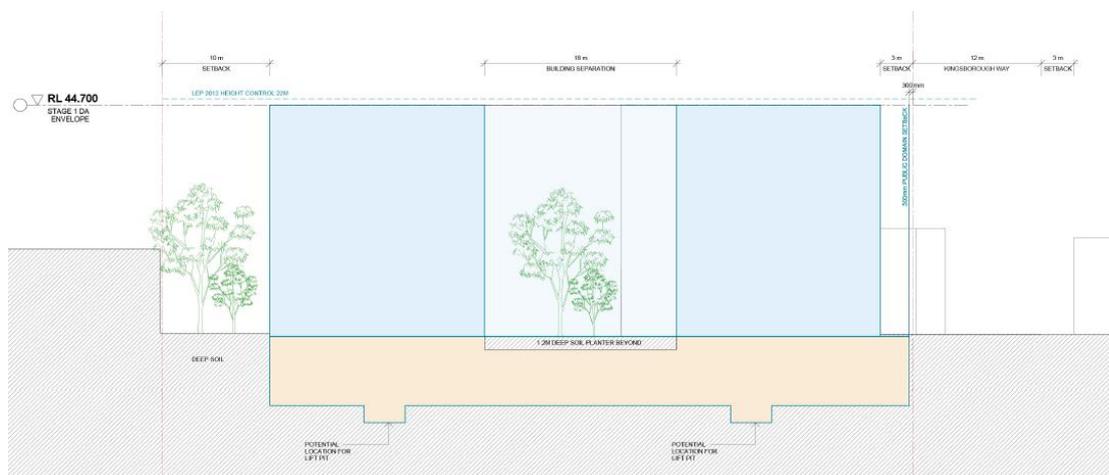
Amended section showing amended planter in courtyard and additional lift pit.
